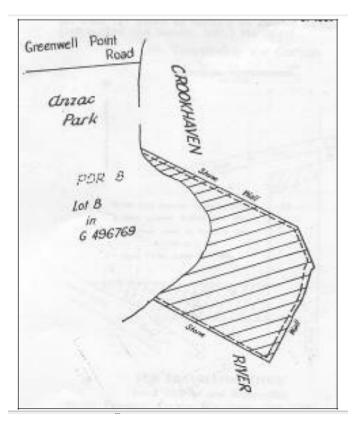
1967 plan of Lots 1B, Greenwell Point (orientated with north at top); showing the stone walls of base of the Berry's Greenwell Point wharf.⁴⁷
